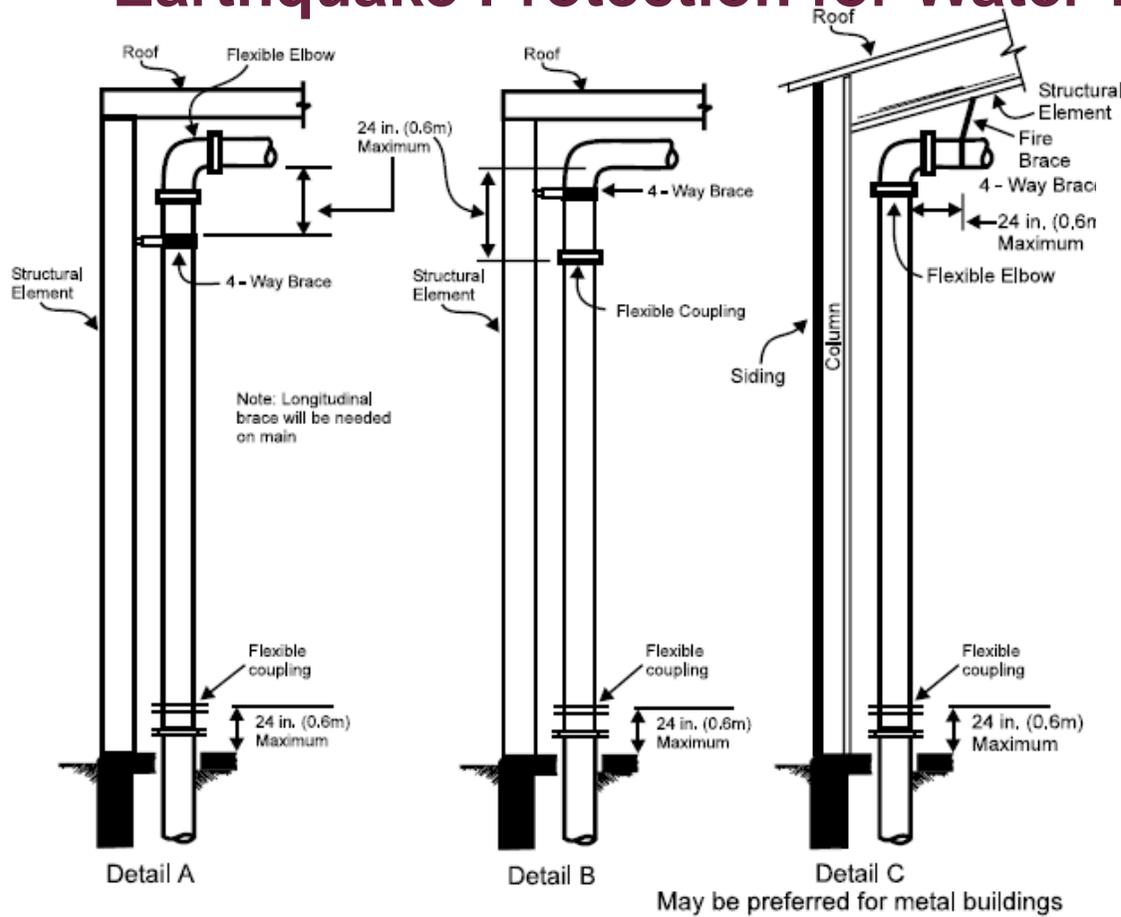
Flexible coupling and four-way sway bracing details for riser. NOTE: for risers located outside of buildings, Detail A or B may be used with the bracing attached to a structural element.
